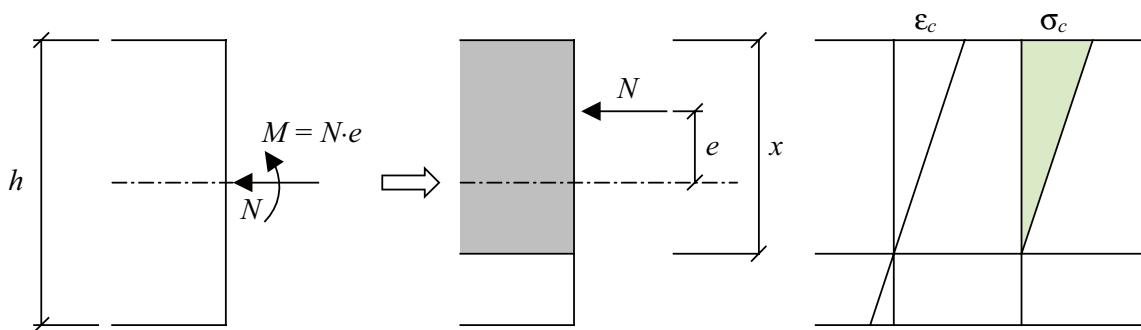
Equilibrium conditions for concrete cross section subjected to moment M and normal force N , assuming a fully linear behaviour.
